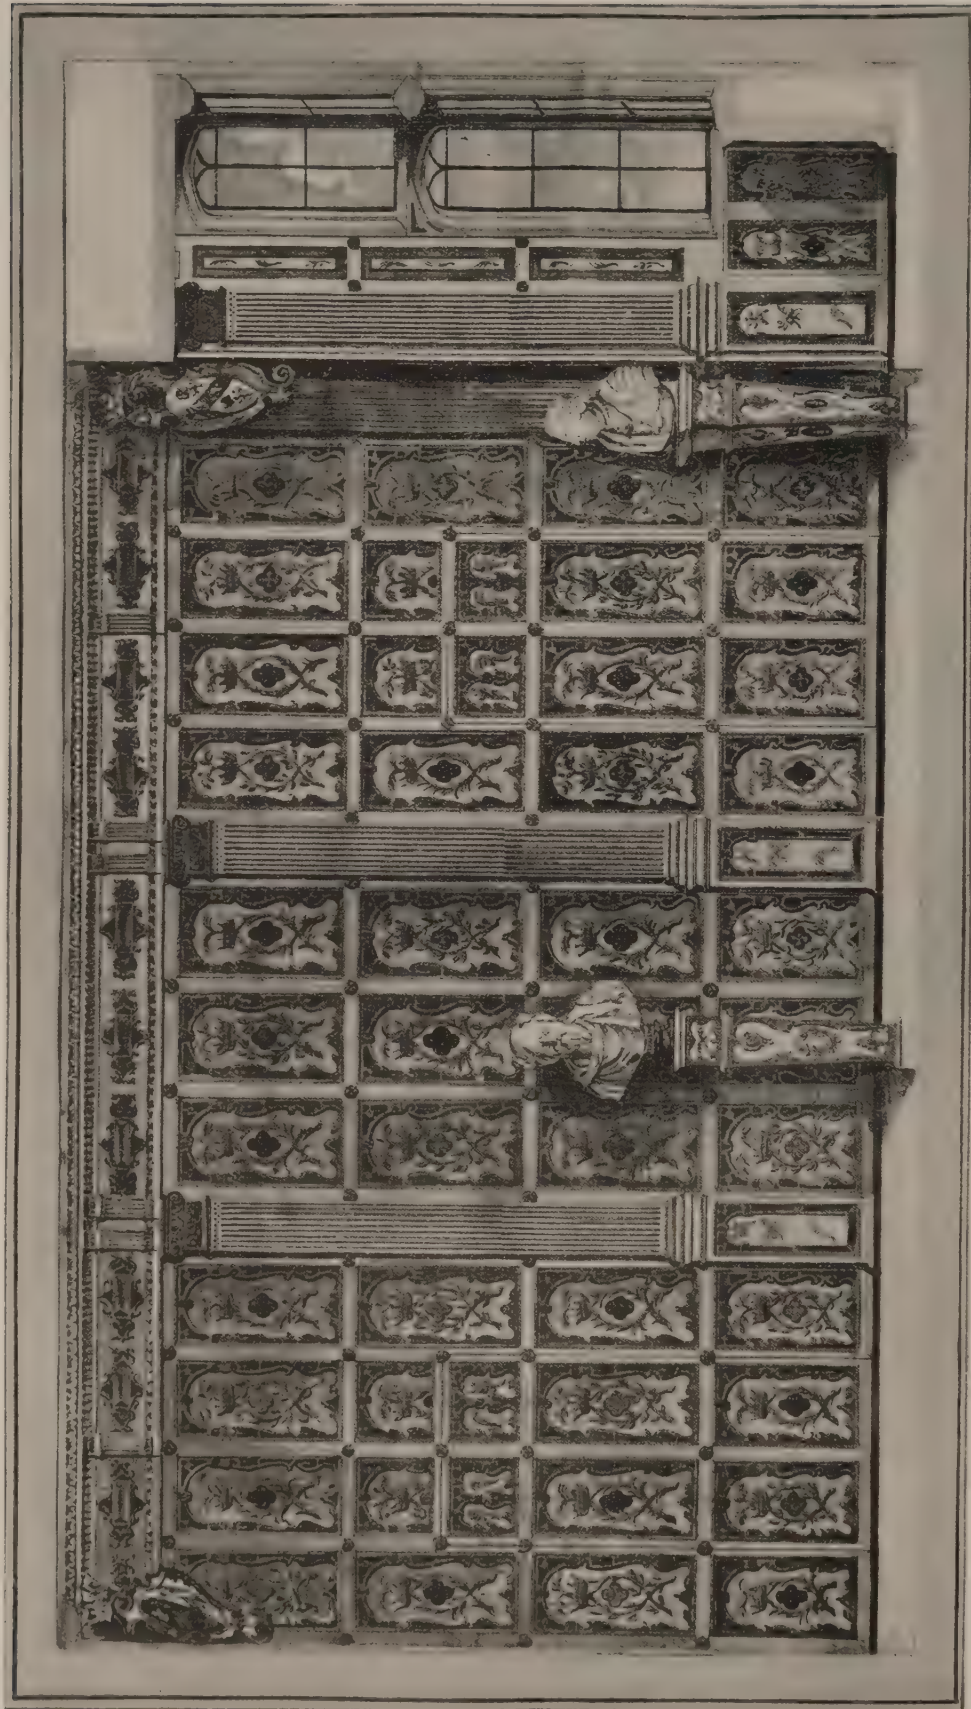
A WALL OF THE GILT ROOM, HOLLAND HOUSE. *Circ.* 1624
